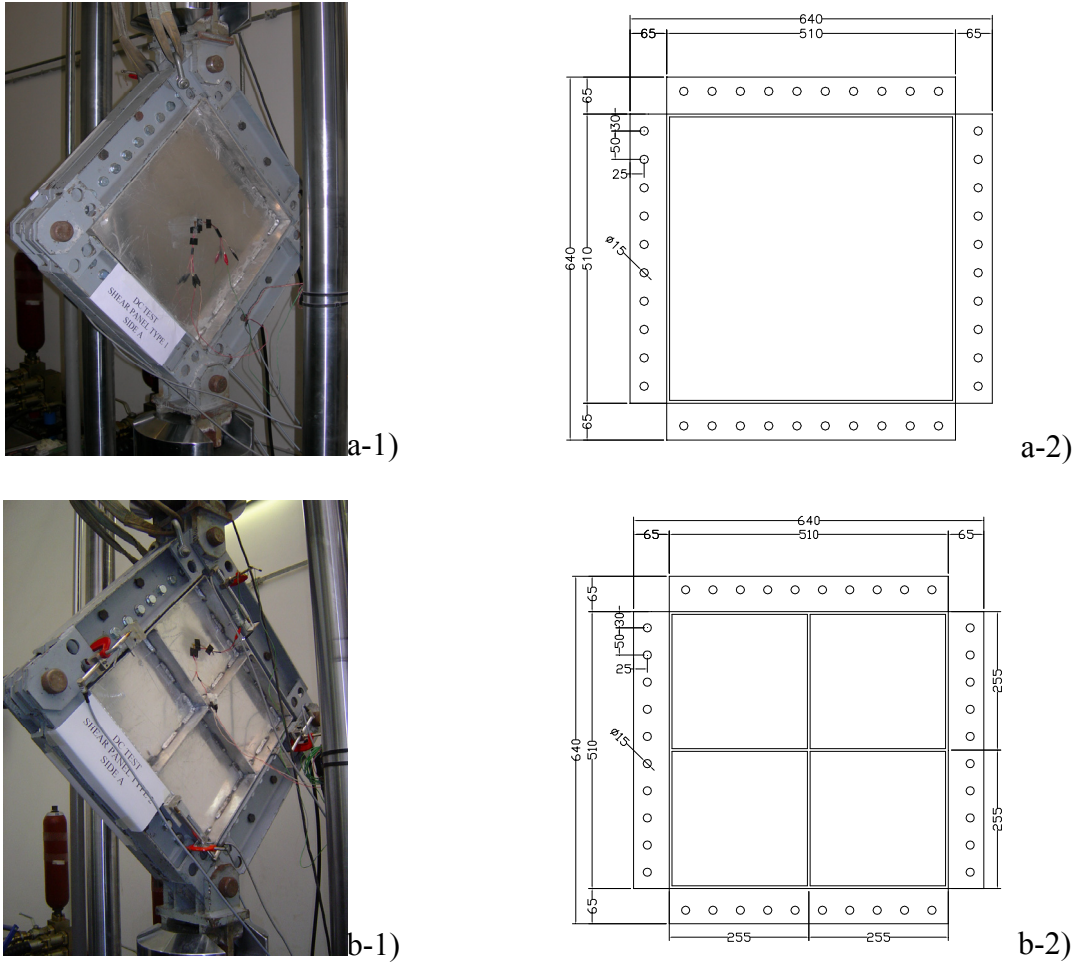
Testing Specimens: (a) Shear Panel “type 1”; (b) Shear Panel “type 2”
